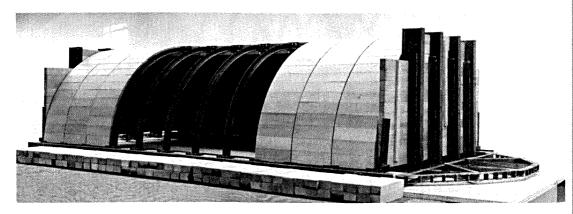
Steps in structure assembly (Sheet 1 of 2).
